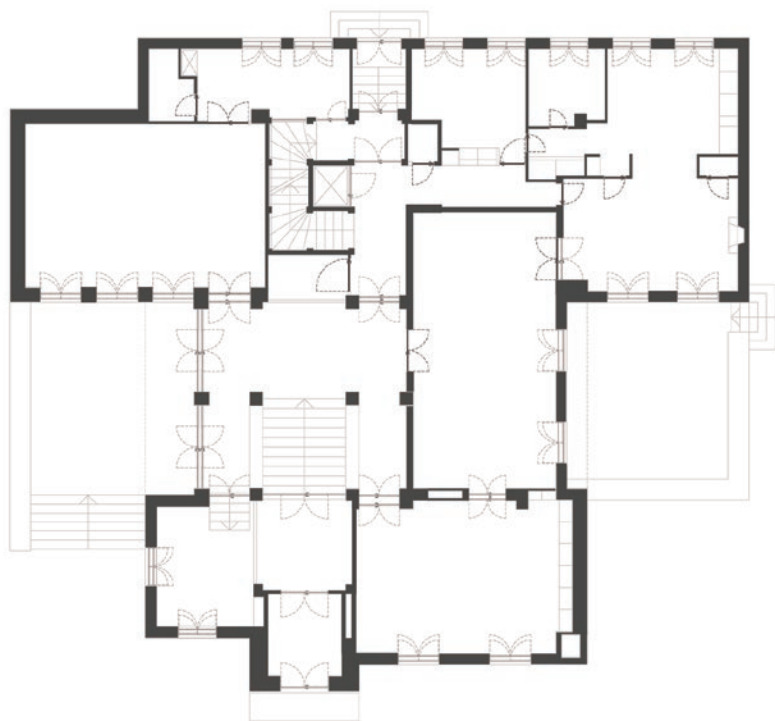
GROUND FLOOR PLAN OF THE WITTGENSTEIN HOUSE, DRAWN BY EMILA BRUCK AND DORIS SCHEICHER.
